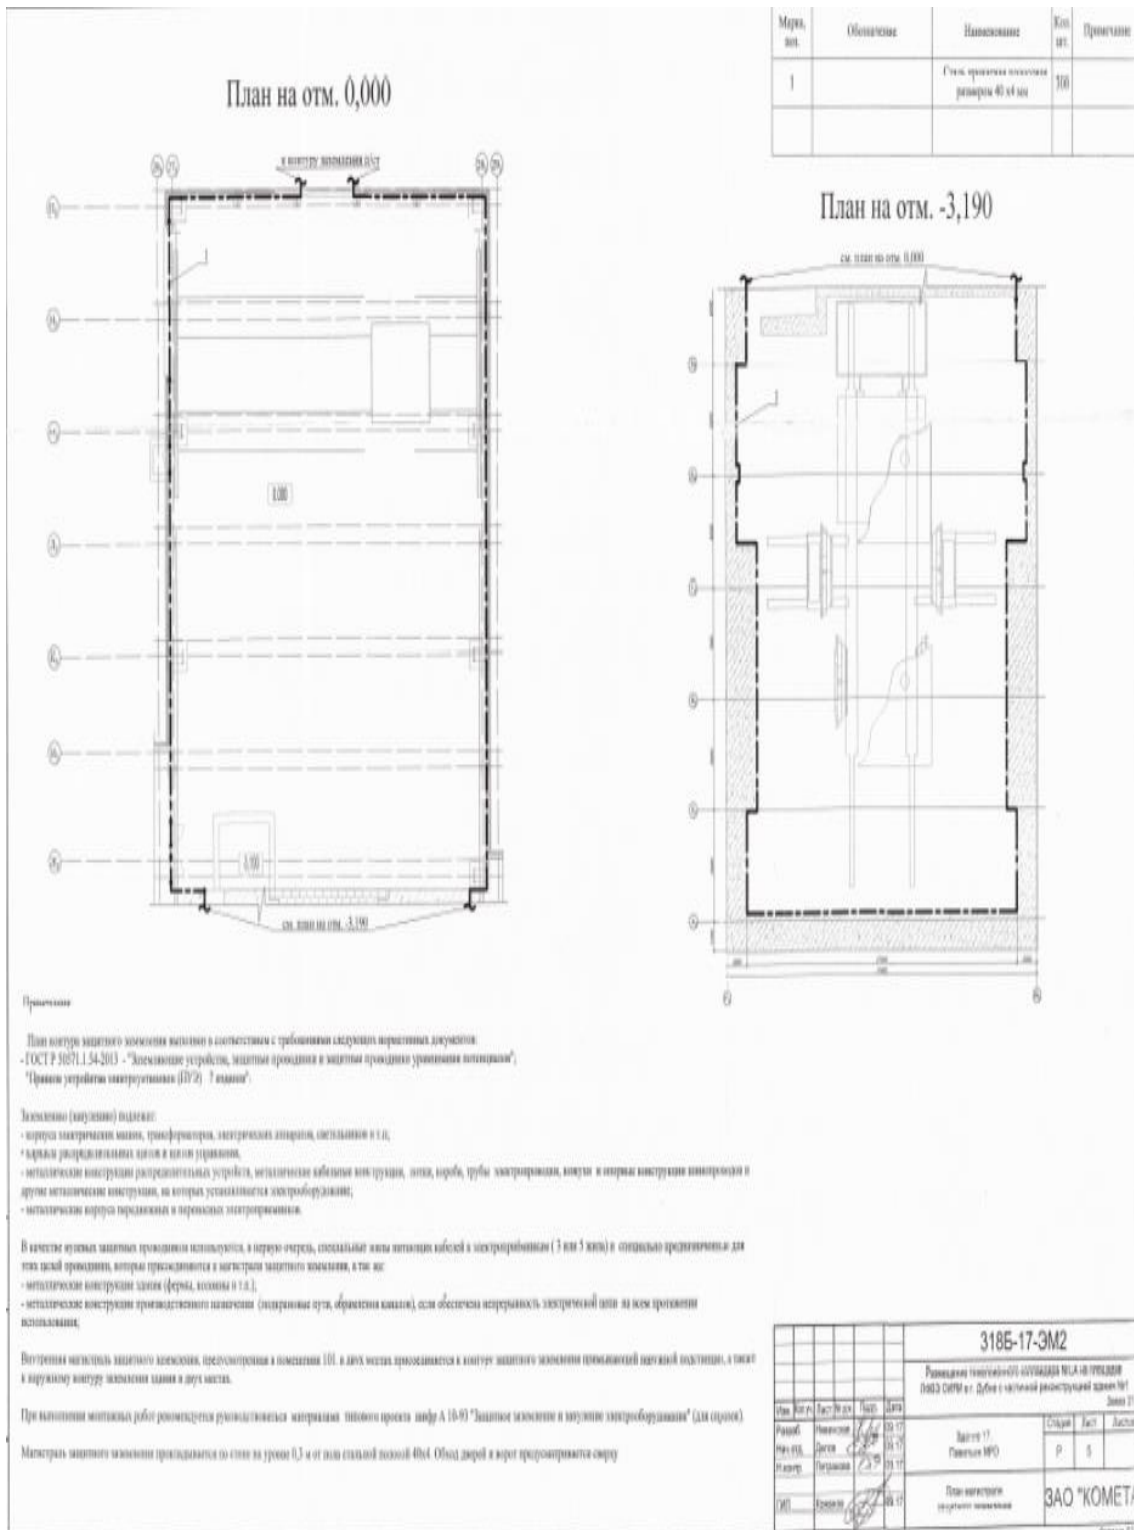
24; Plan PLATFORM MPD NICA connections, LEVEL A
